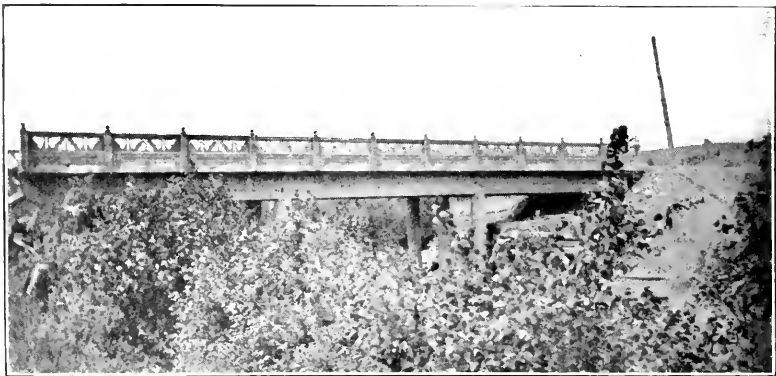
REINFORCED CONCRETE TRESTLE OVER RAVINE NEAR DULUTH. SHOWS A VERY HANDSOME FORM OF CONCRETE RAILING. BUILT UNDER THE SUPERVISION OF THE COUNTY BRIDGE ENGINEER.
